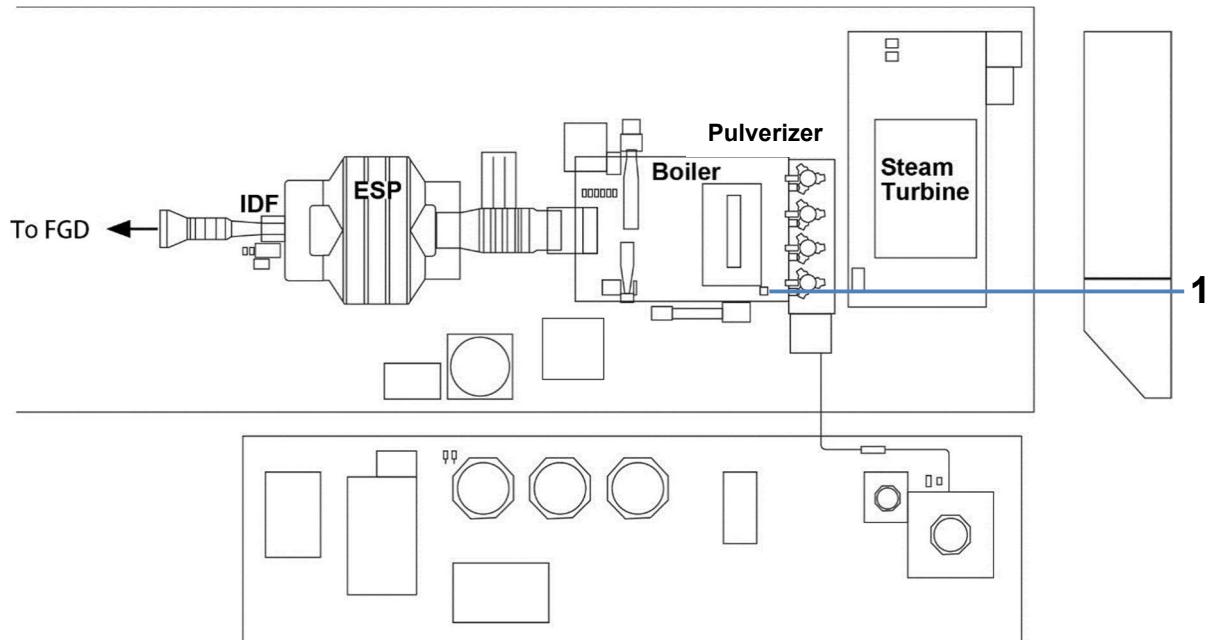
Blowdown Drain System Arrangement (Typical arrangement example)
